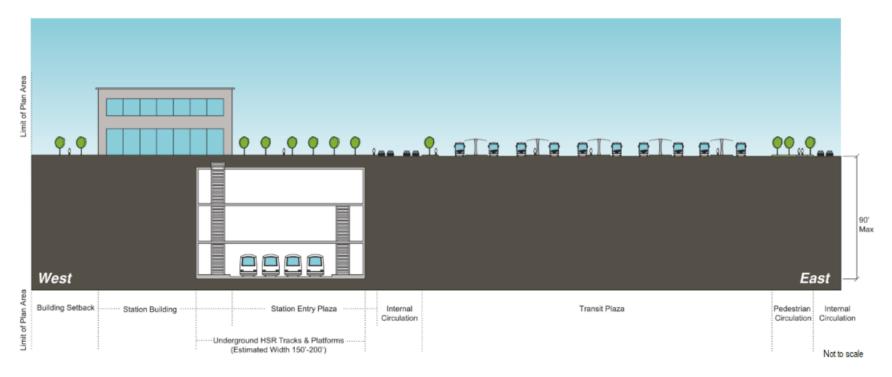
Burbank Airport Station Preliminary Station Concept Layout Plan—Cross Section
